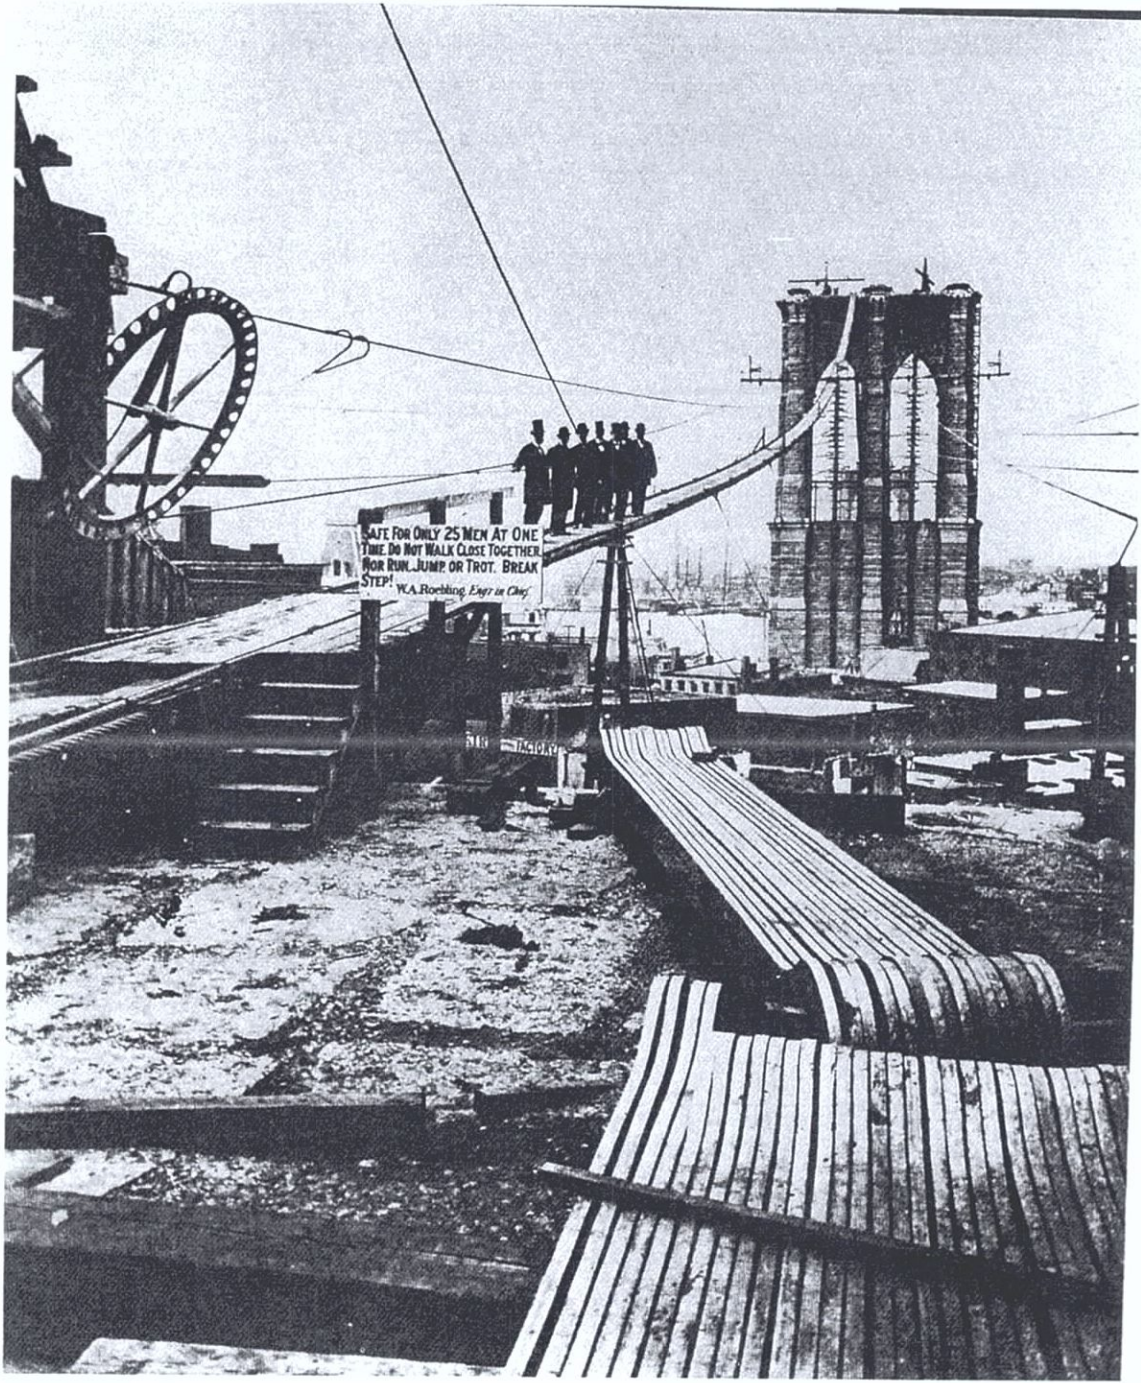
Photograph of Brooklyn Bridge, Fulton Ferry Building, Block 25, 1880 (Shapiro 1983).
